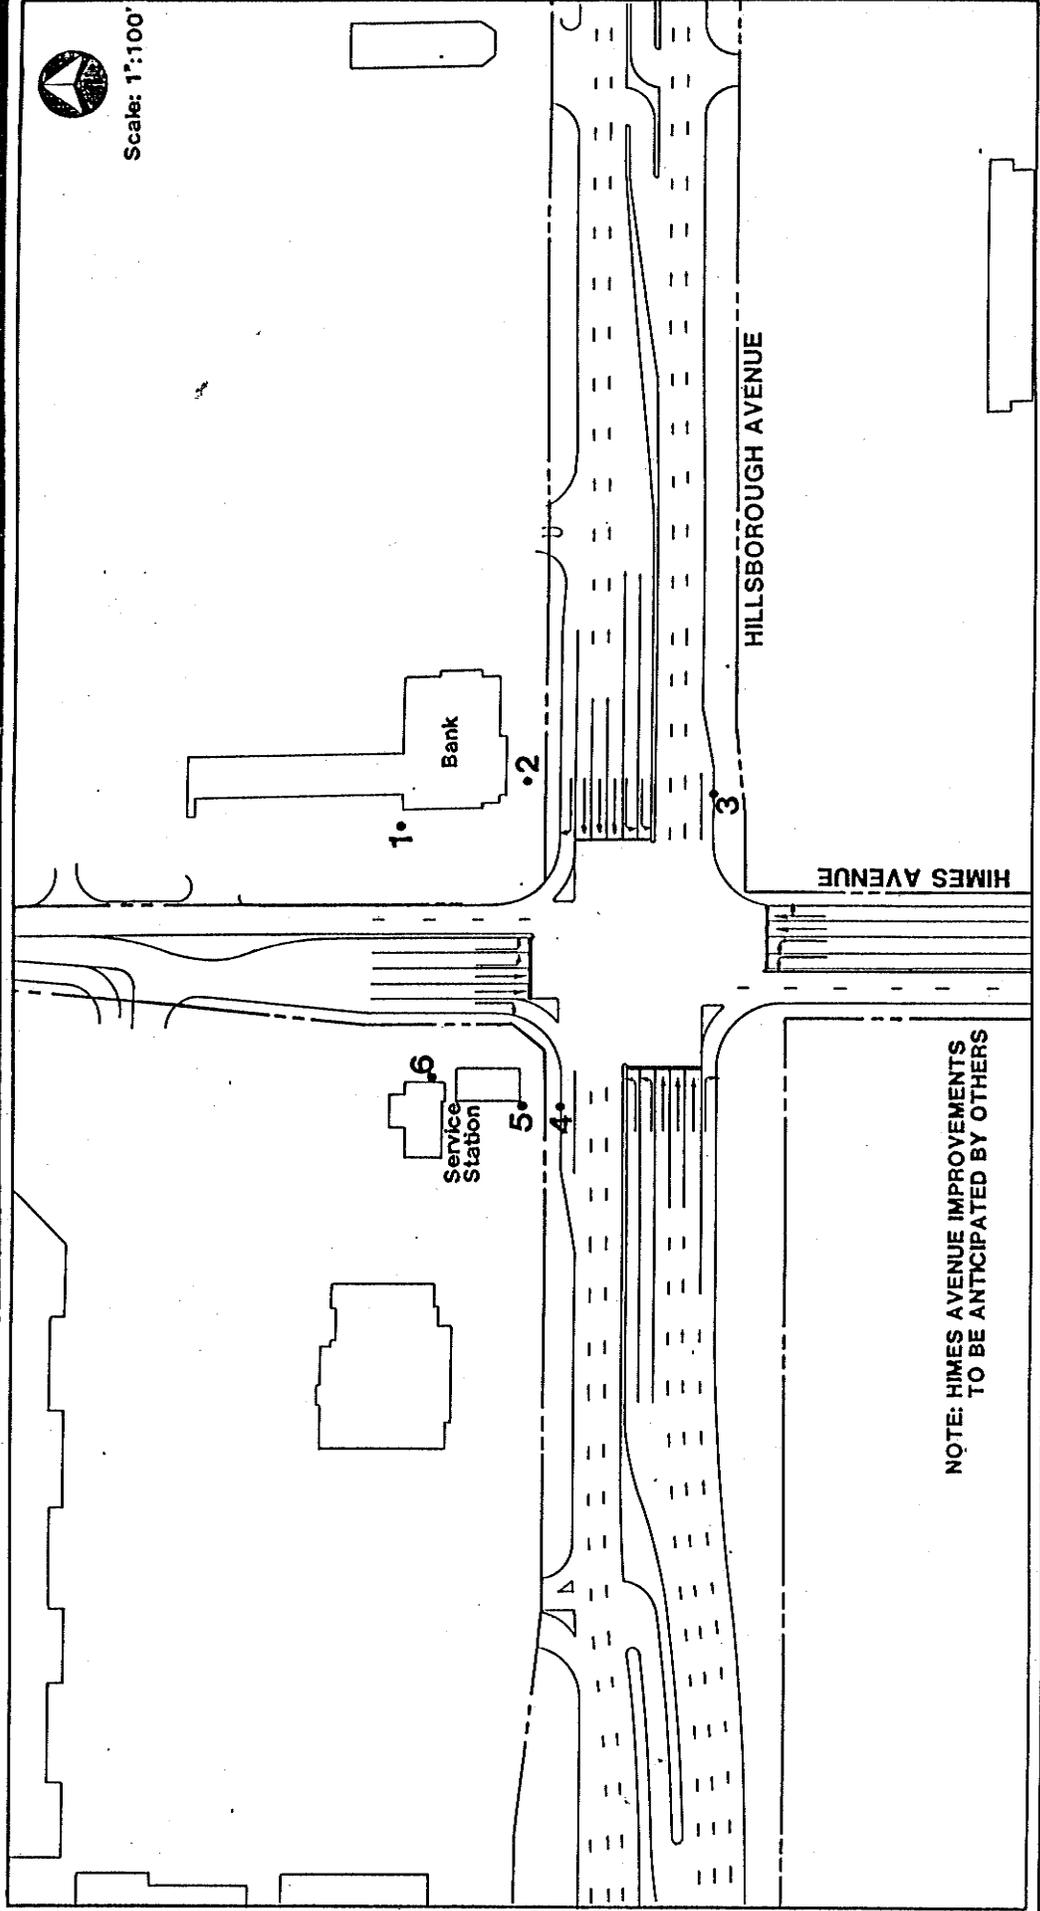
HILLSBOROUGH AVENUE - HIMES AVENUE
